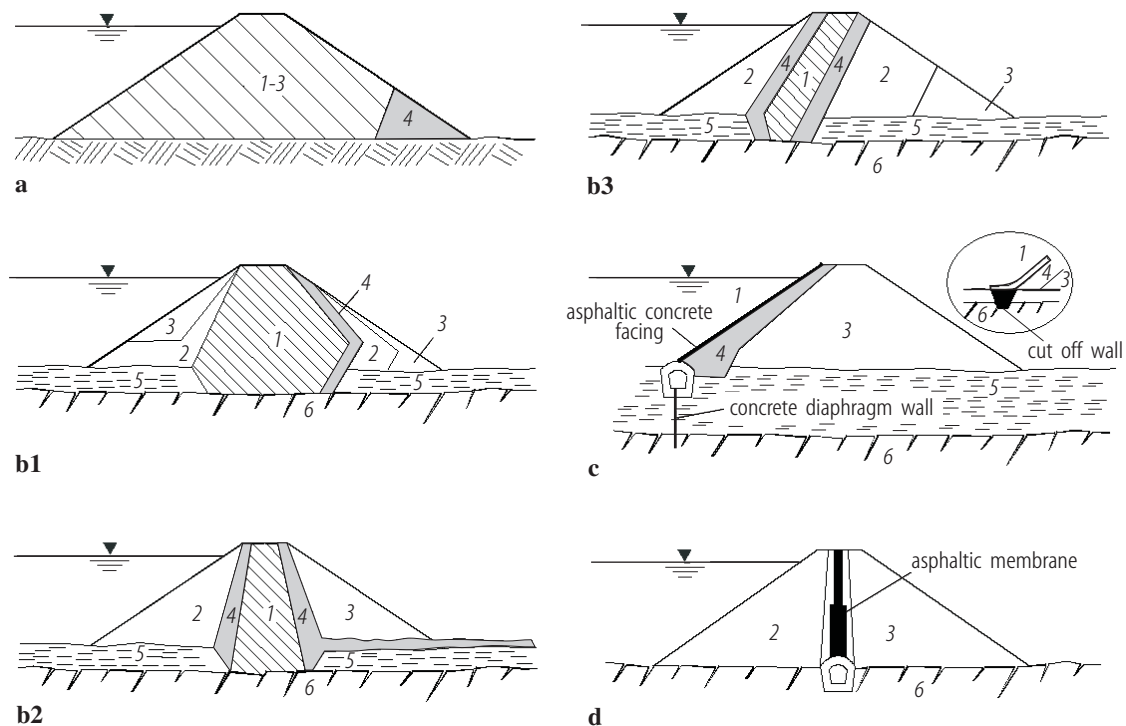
Types of dams and their typical cross sections. (a) Homogeneous dam. (b1) Dam with broad central core. (b2) Dam with narrow central core. (b3) Dam with upstream inclined narrow central core. (c) Dam with upstream sealing membrane. (d) Dam with central thin sealing membrane.
